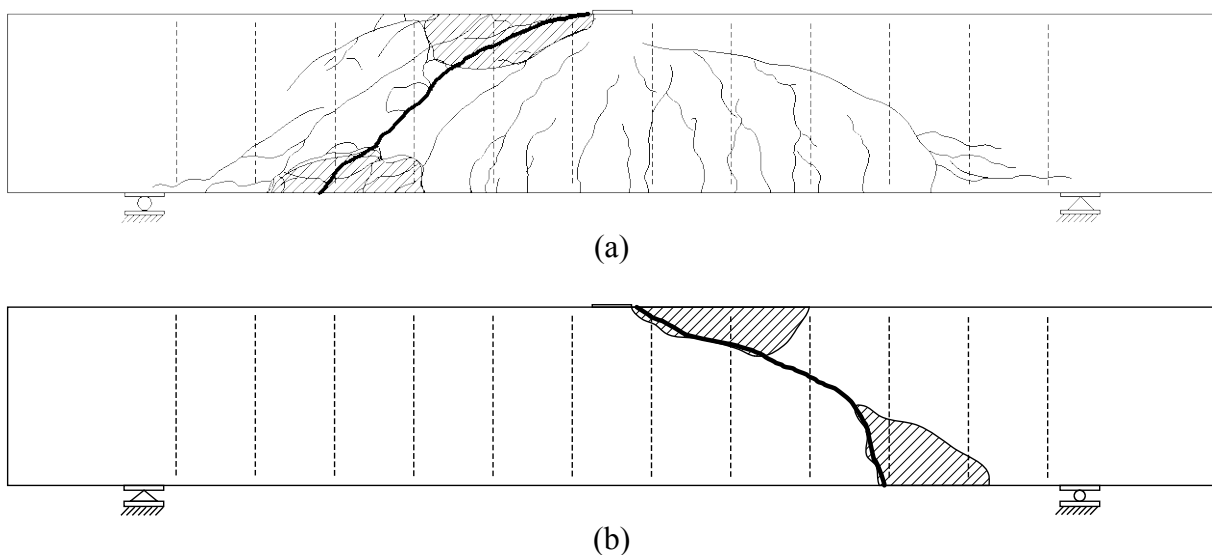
Observed damage in specimen P1S1, (a) front side, (b) back side
